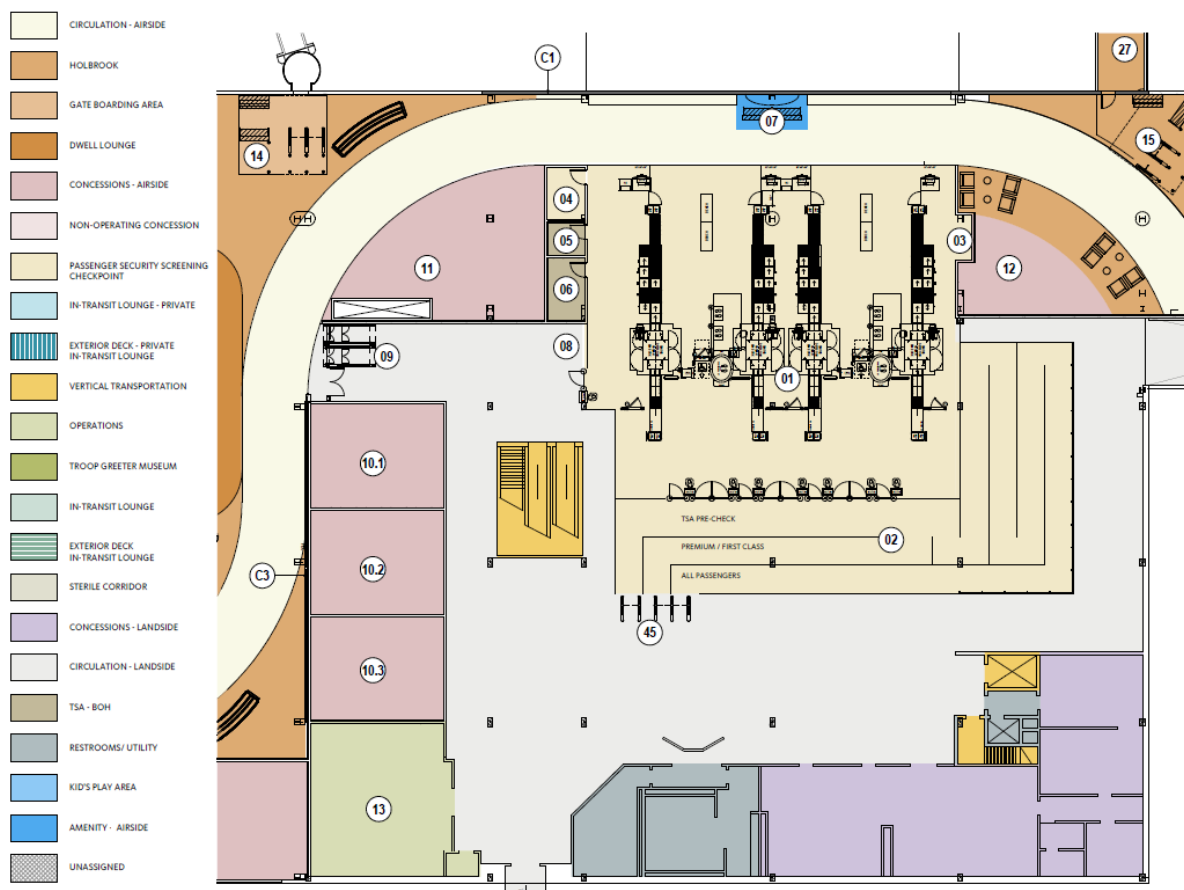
Plan Detail: Proposed “Hybrid” SSCP Redevelopment Concept
